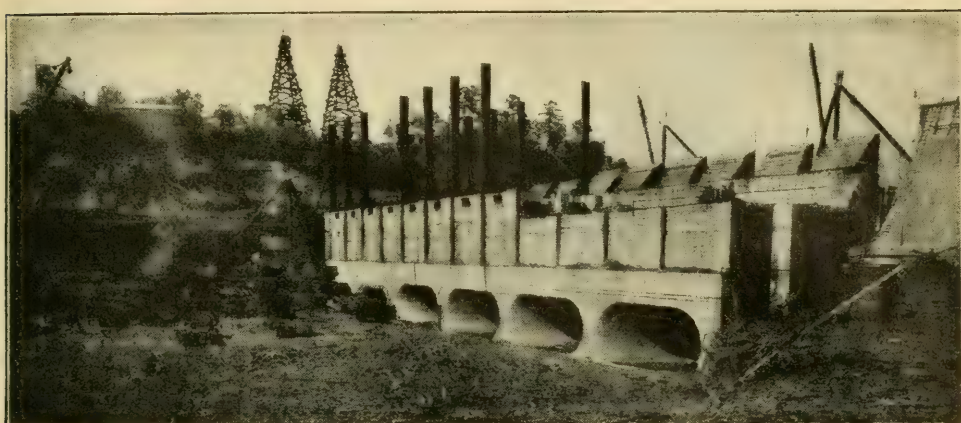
DOWN-STREAM VIEW OF POWER-HOUSE FOUNDATIONS, AFTER COMPLETION OF SECOND STAGE OF CONSTRUCTION.
